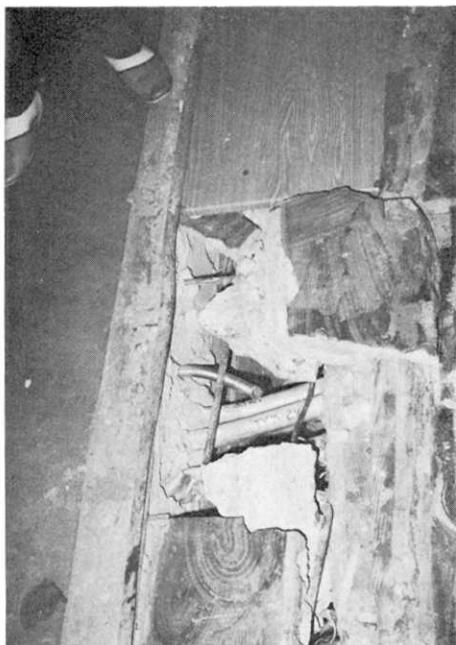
Broken expansion joint in the reinforced concrete building of Urakawa primary school.
